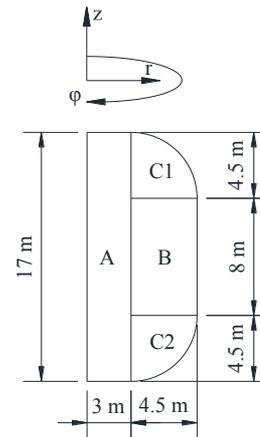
HALF OF CROSS-SECTION OF STORAGE SPACE
